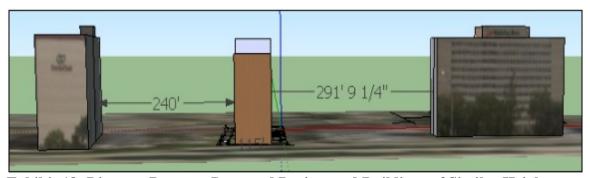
Distance Between Proposed Project and Buildings of Similar Height
